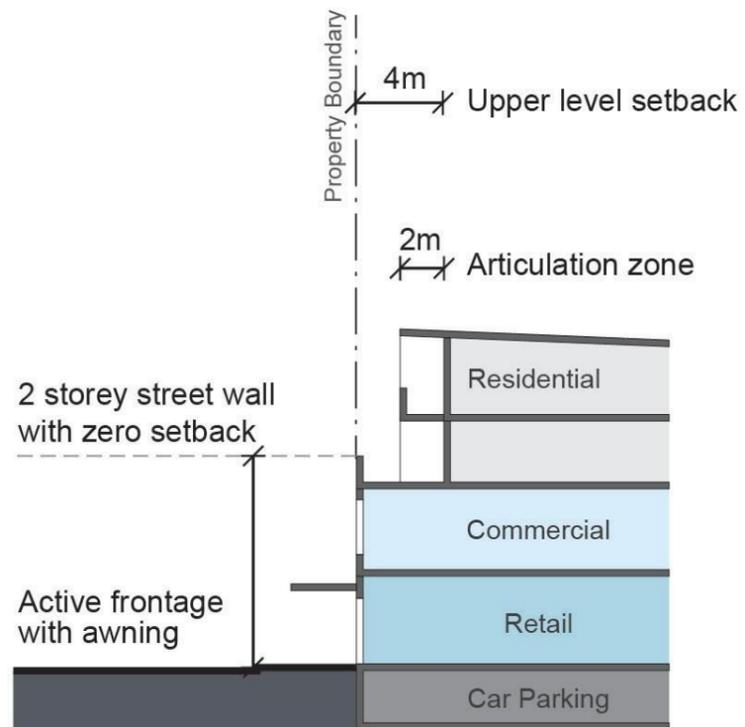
Setback Type 1a - 4 Storey with 2 Storey Podium
